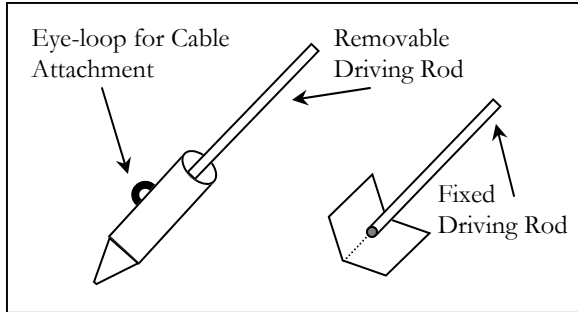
A. Earth Anchor. A metal plate or cylindrical tube that pivots on an attached anchoring rod or cable. The loaded anchor planes sideways against undisturbed soil to provide holding strength.
